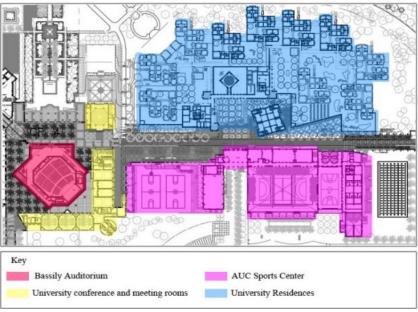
Master Plan of Zone C, AUC Campus, New Cairo
